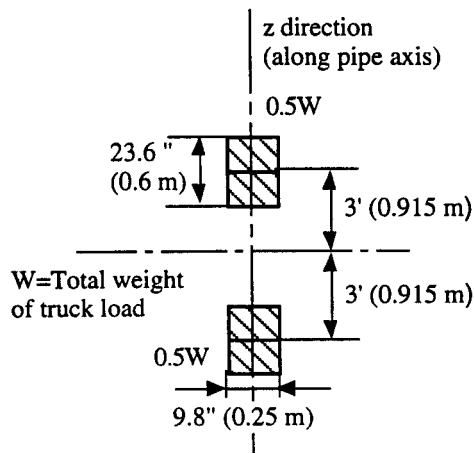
Plan of simplified AASHTO H-20 Highway Loading on the centerline of the pipe-soil system
